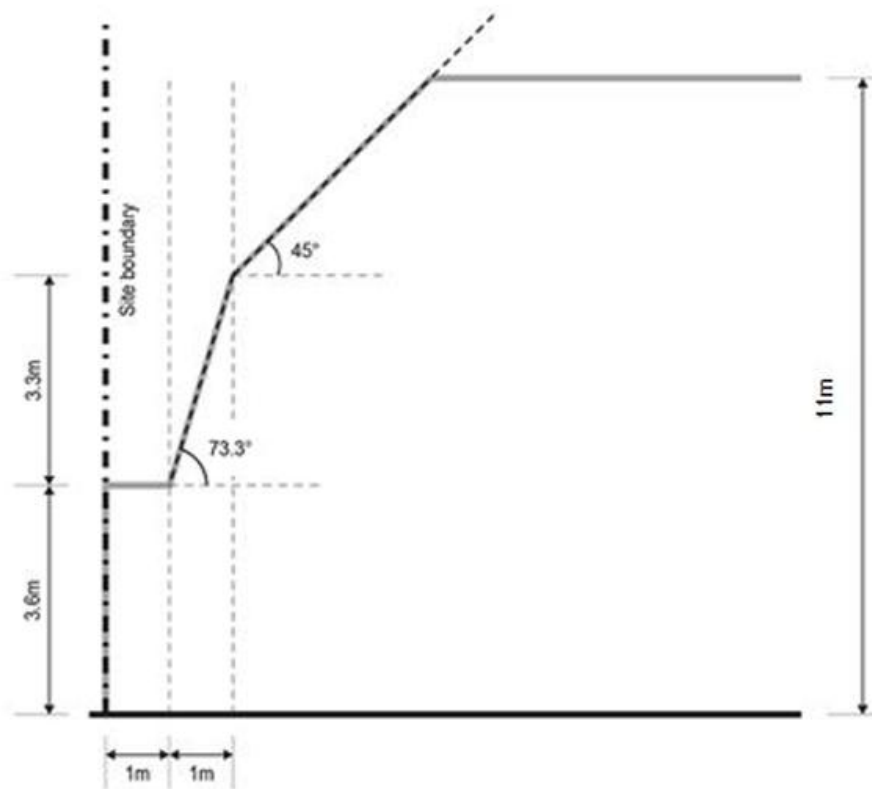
Proposed HIRB between THAB and MHU zoned sites (Source: PC120).
